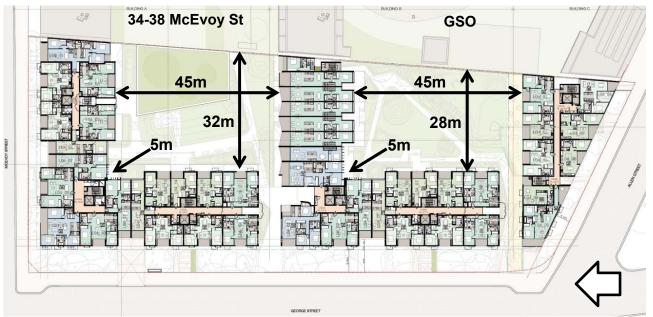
Proposed indicative mid-level floor plan showing building separation.
